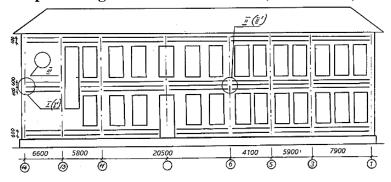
The scheme of strengthening the external brick walls of the building by placing pre-strengthening reinforcements (courtyard facade).
